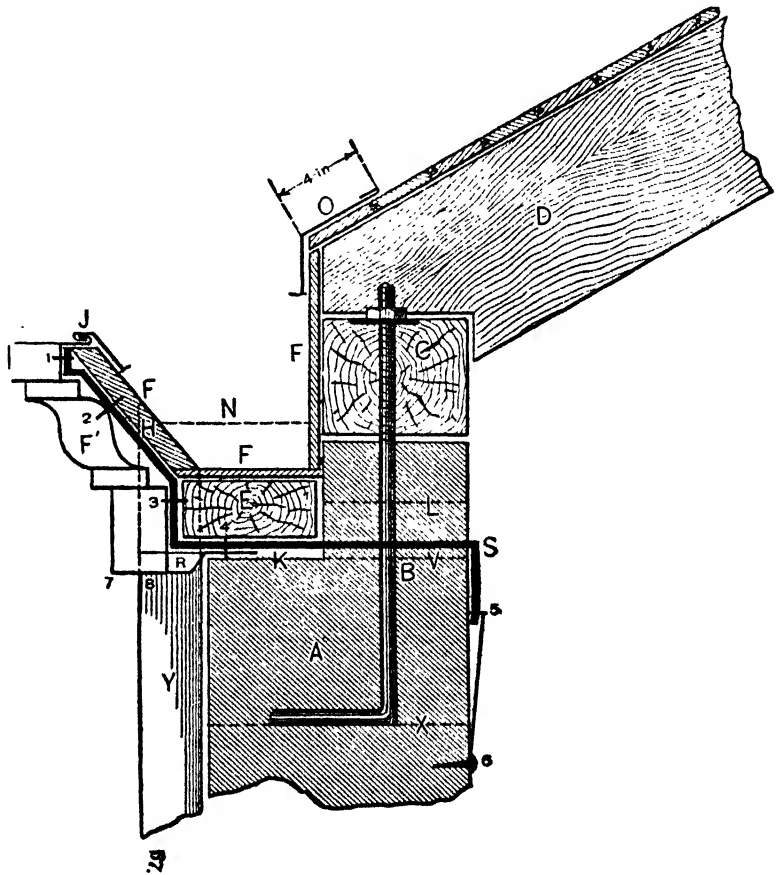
Fastening a Sheet Metal Molding to Brick Wall
